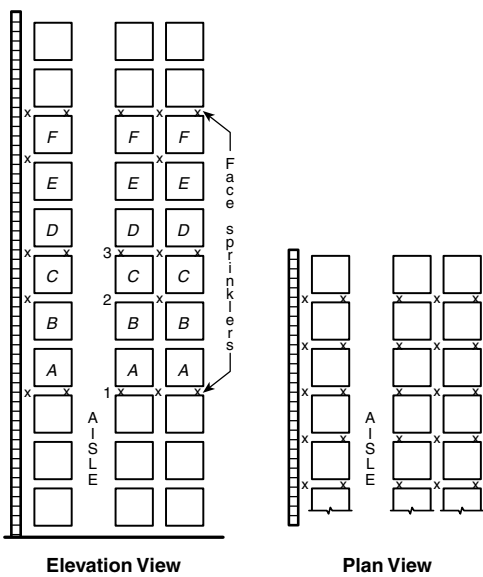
Positioning of In-Rack Sprinklers in
